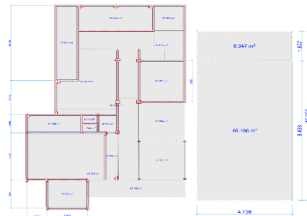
Senja Coffee and Memories Godean First and Second Floor Plan
